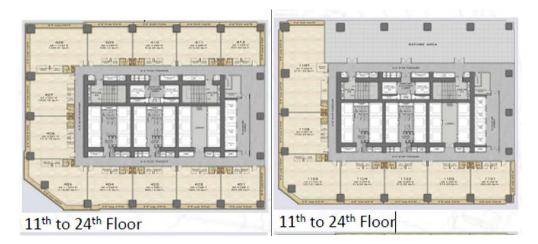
The floor plans reveal a central core system and external bearing walls
